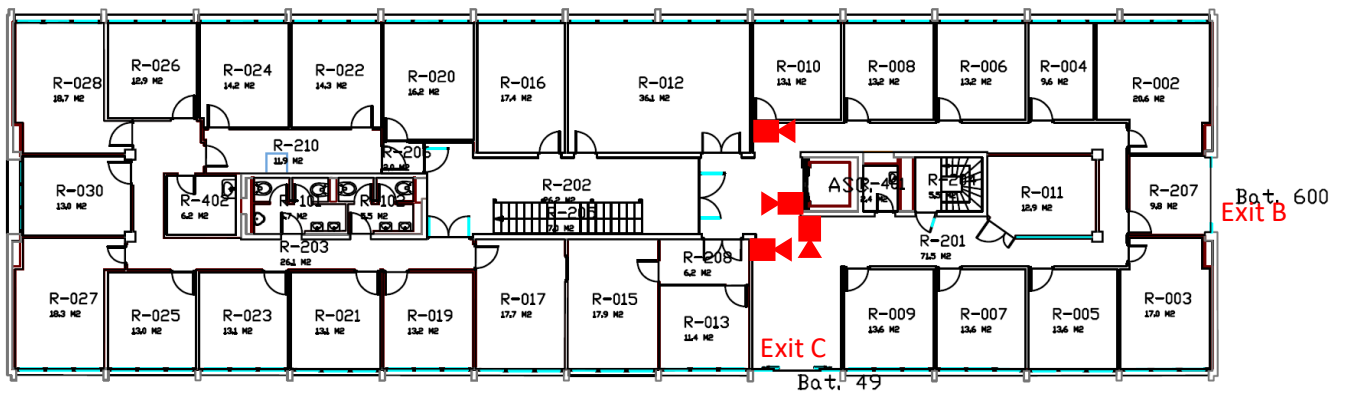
floor R0 layout the locations and orientations of cameras, and the locations of emergency exits within this floor – building 1
